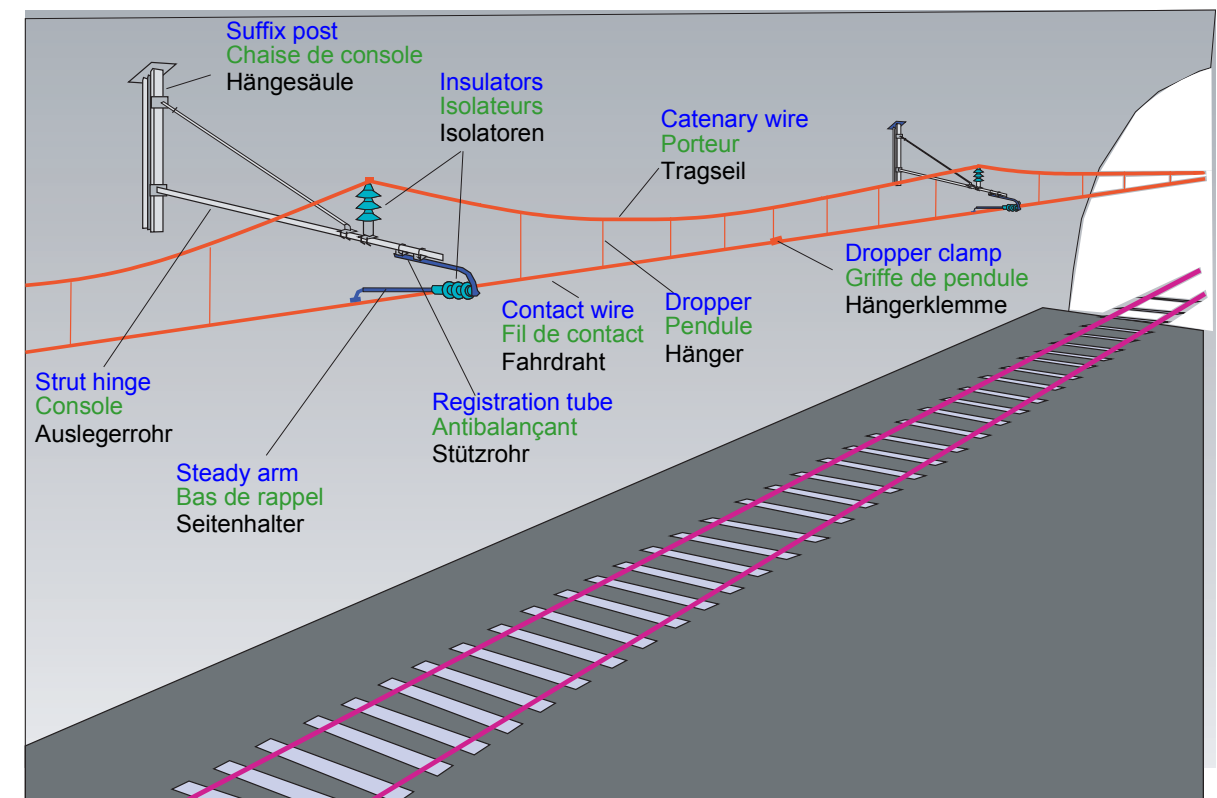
Section of OCL in a tunnel - Caténaire en tunnel - Oberleitungsabschnitt in einem Tunnel
